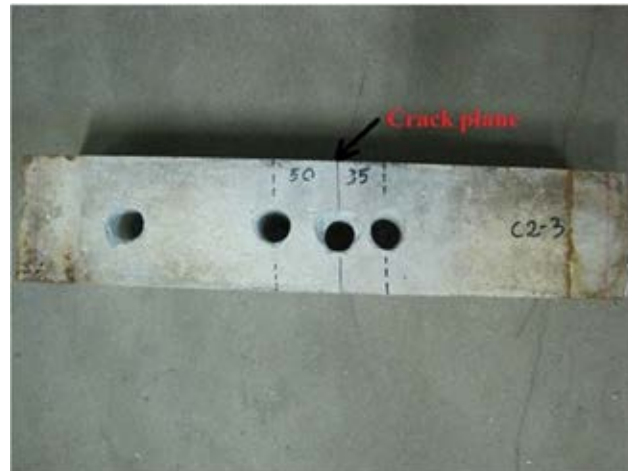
Beam 3 - The chloride profile locations at 30mm and 50 mm away from crack plane.
